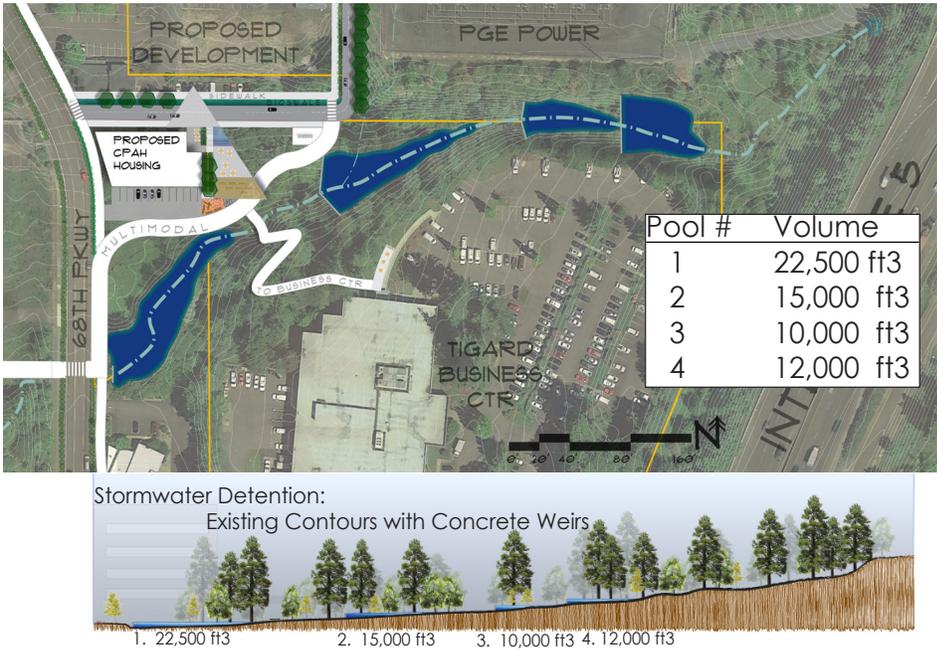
Site plan with constructed weirs in Red Rock Creek.
